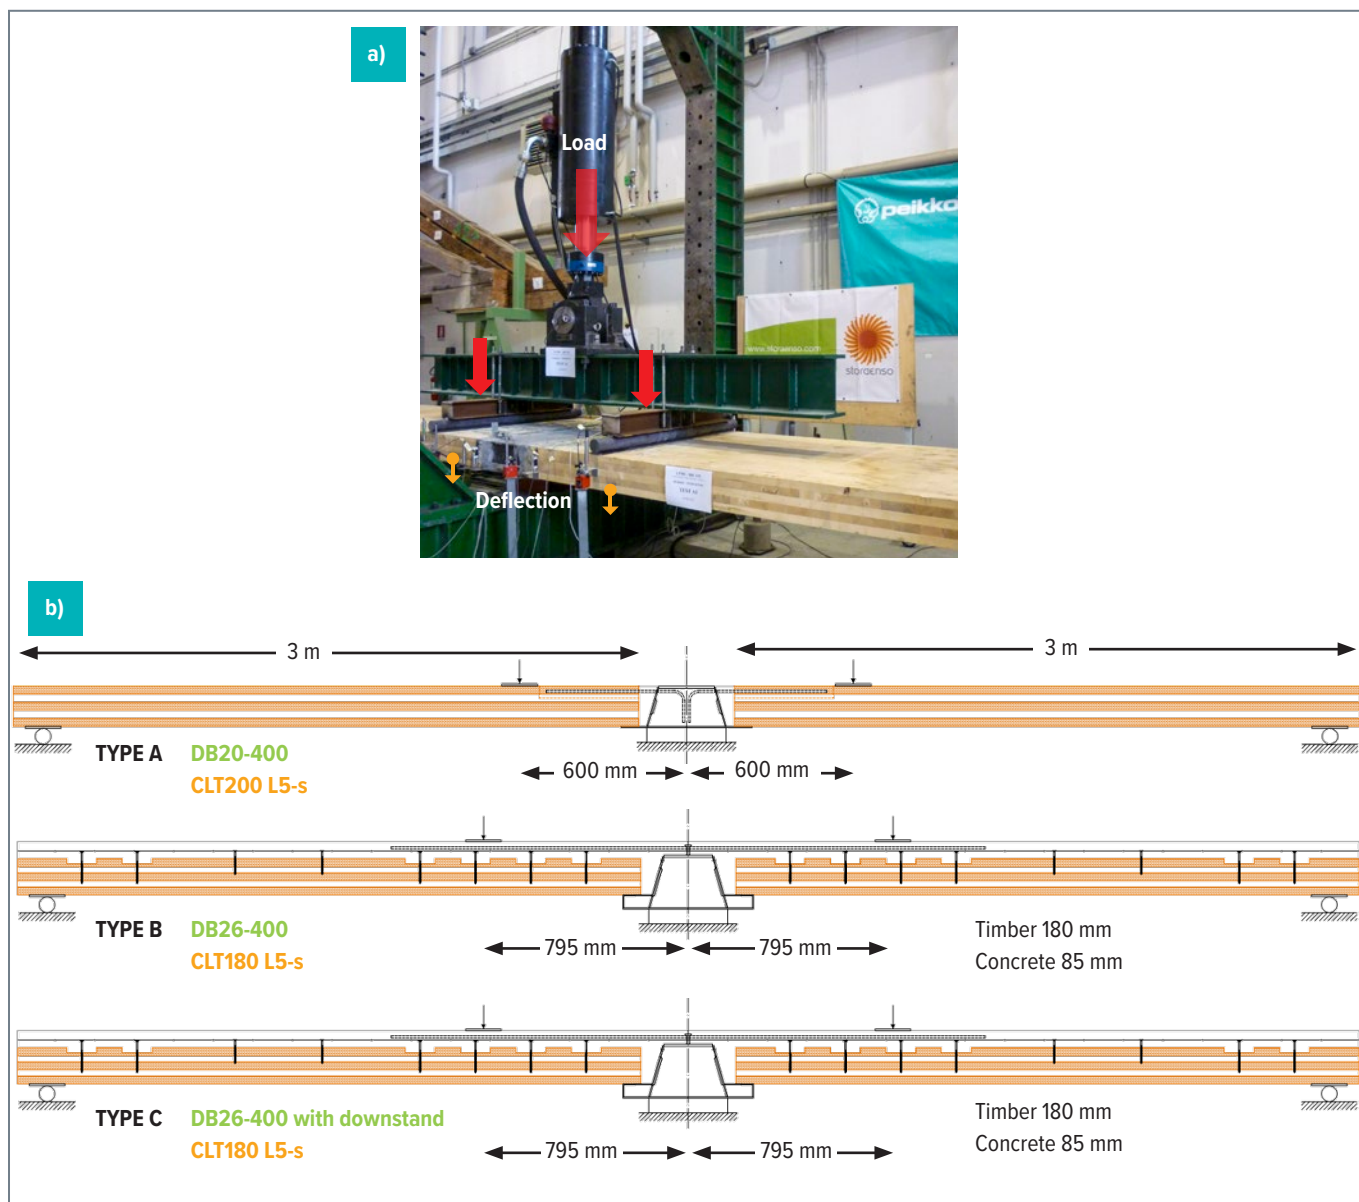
A) LAB TEST SETUP; B) SPECIMENS' DIMENSIONS
